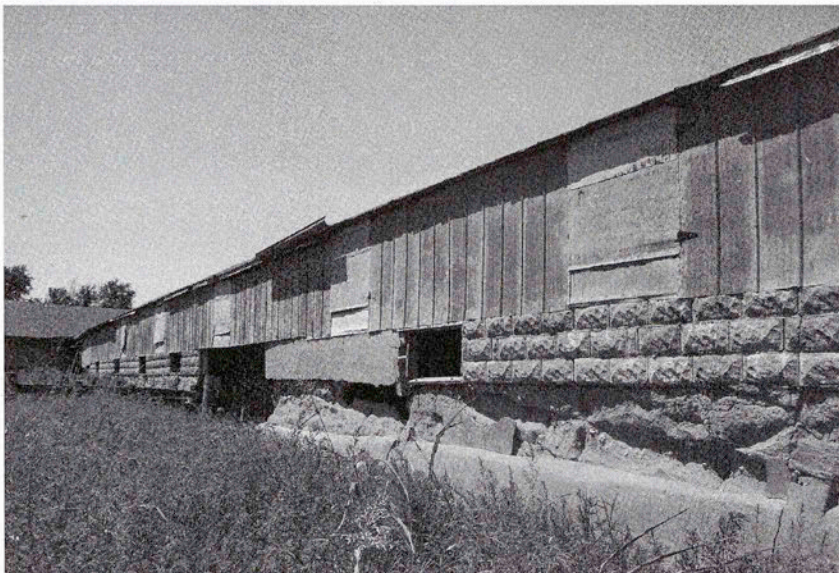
The south side of the Bredel horse and cattle barn where Otto Bredel used three types of masonry construction to build the foundation and lower wall of the barn. Above the masonry wall are loft openings. Windows built into the concrete blocks open into the livestock stalls.
